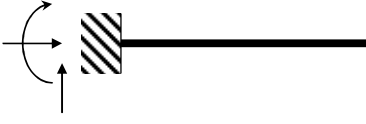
Components of restraint surrounding structure imposes upon two-way spalling slab
